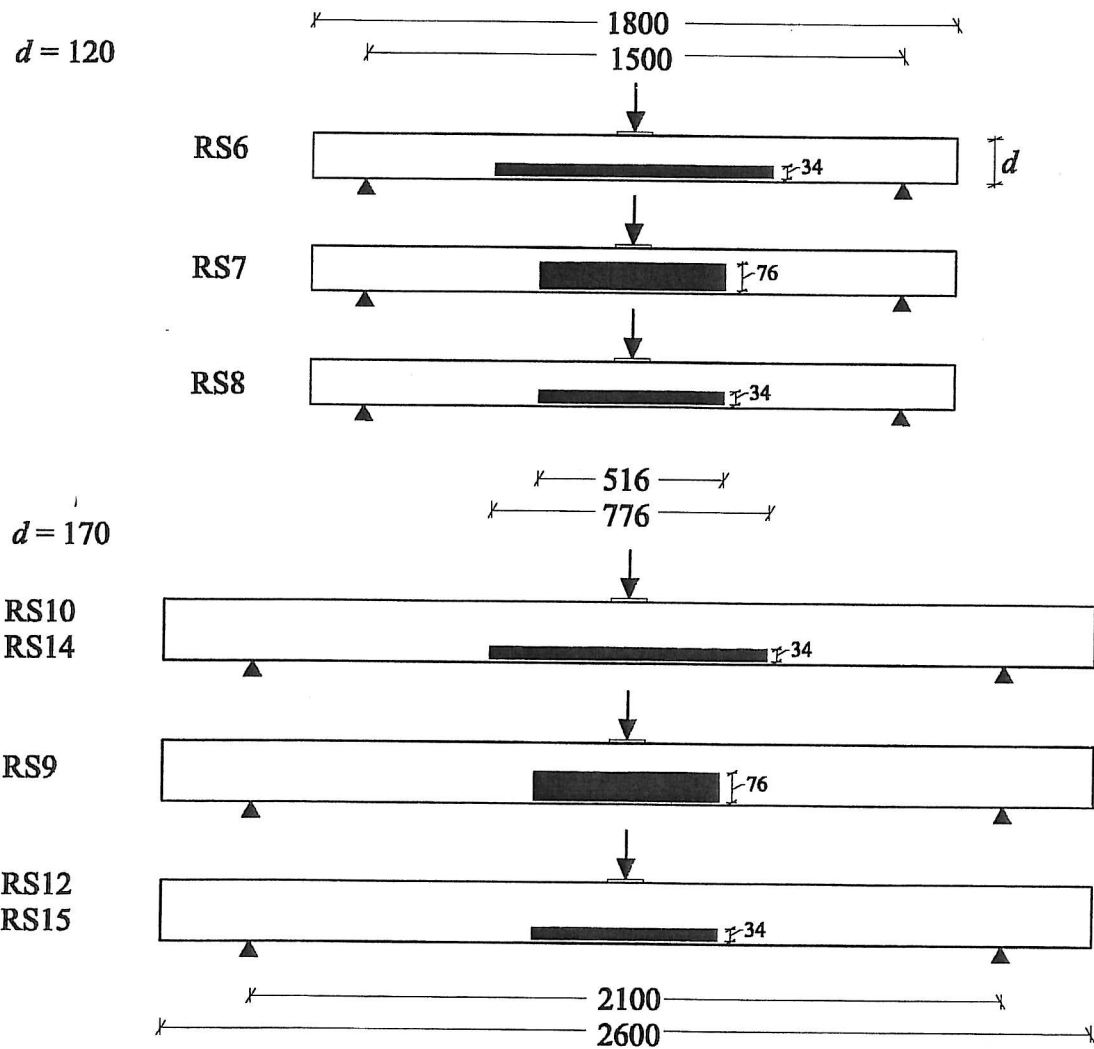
Test specimens with plate reinforcement. Dimensions in mm.
